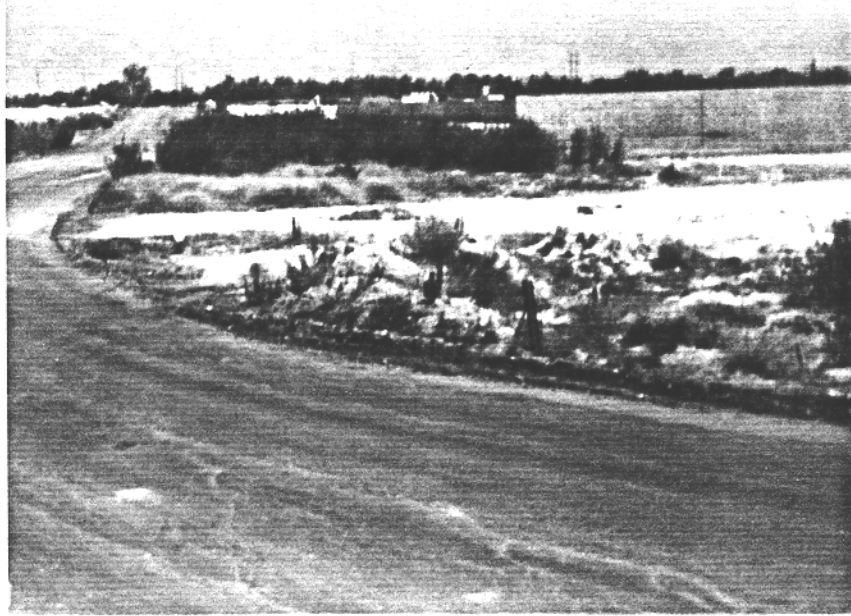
Invert of Lytle Creek East Branch Channel, Elev. 1143.0, With Haul Road Crossing Toward Muscoy Levee. Looking East. A Portion Of Lytle Creek Inlet Structure.
